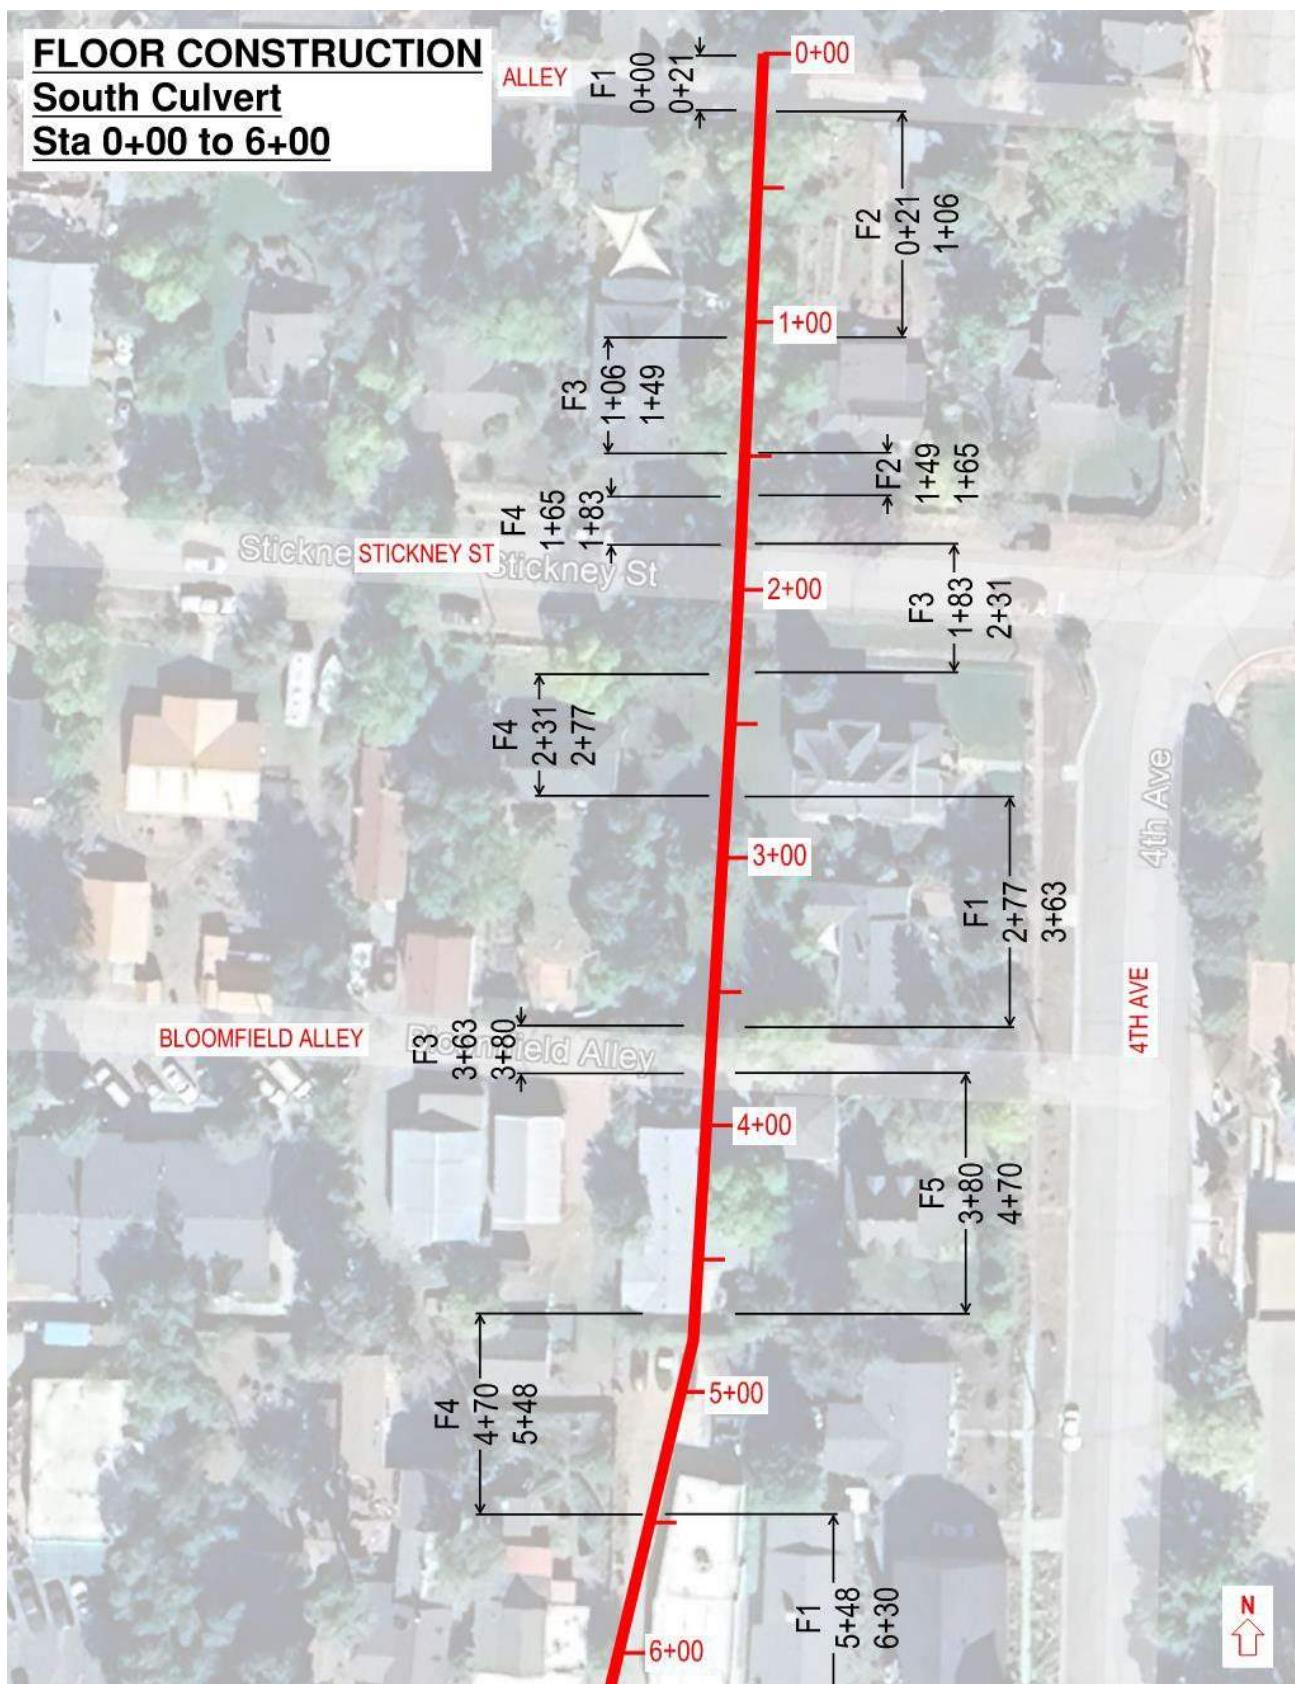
South Culvert Floor Construction Stations (S)0+00 to (S)6+00
